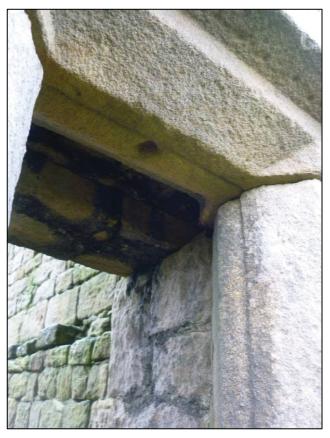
Window W10 in elevation 10, showing glazing slot etc (photo 2/534).
